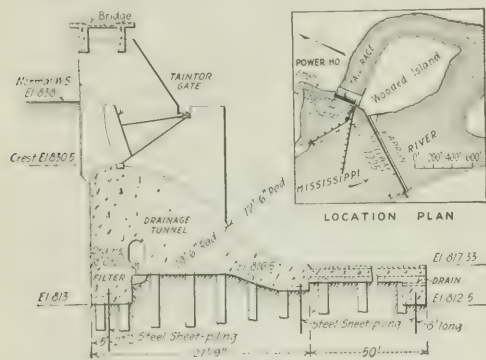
CROSS-SECTION OF SPILLWAY DAM AND APRON AS BUILT AT COON RAPIDS, MINNESOTA
